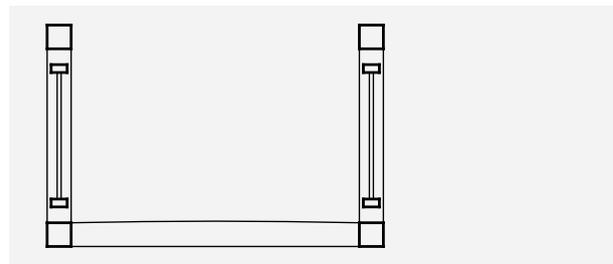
Typical half-through pedestrian bridge (truss and viereendeel girder construction)
